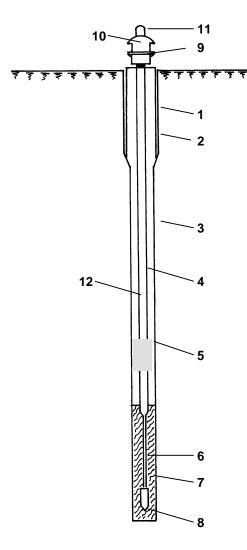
Typical borehole plan for conducting an underground nuclear test: 1- 1420 mm borehole; 2- 1120 mm steel pipe; 3- 1000 mm borehole; 4- 168 mm casing; 5- cement grout; 6- 89 mm casing; 7- rubble; 8- charge; 9- unloading device; 10- elevator; 11- dynamic device; 12- additional plug of rubble.
